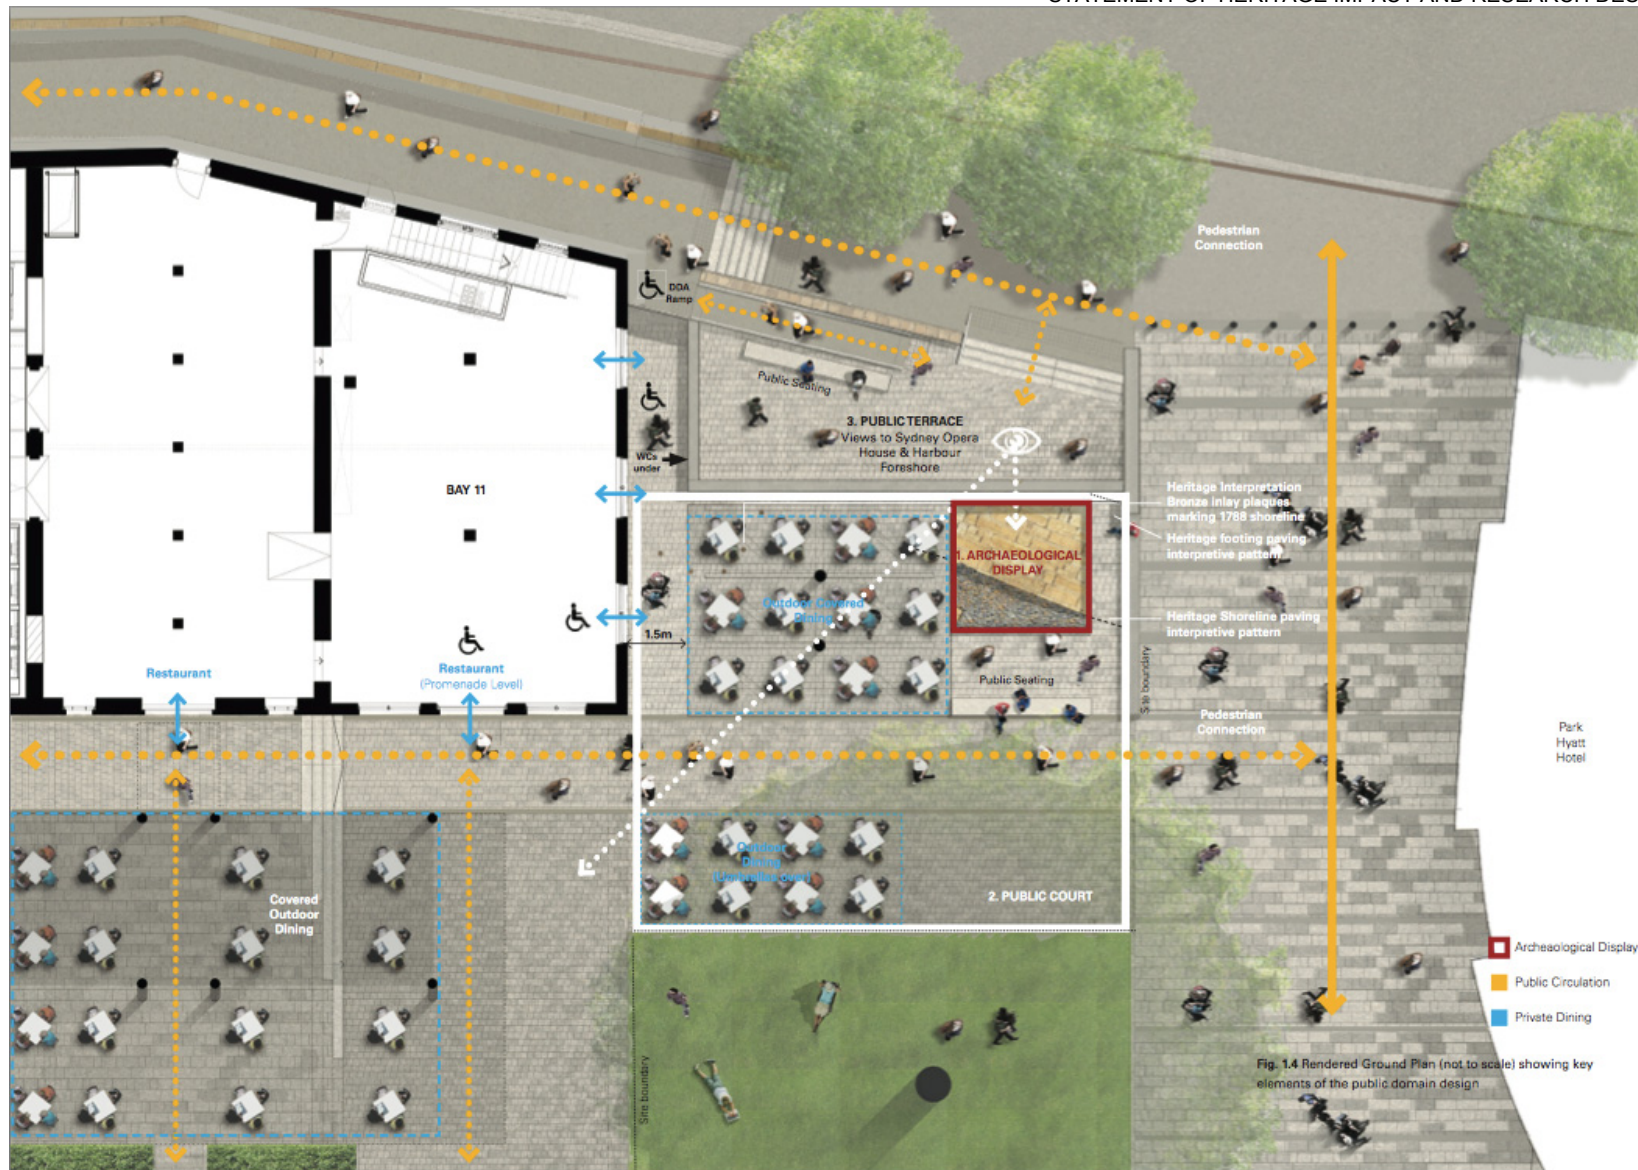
Bay 12 Concept Plan. Note north is to right hand side (rhs) of page. (Detail from p5 JPW Design Statement)
